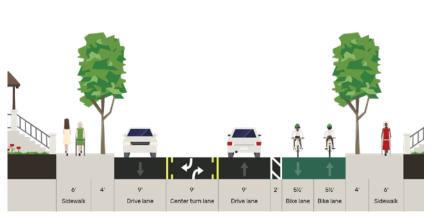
Collingwood Blvd Street Design Option. Made with Streetmix.
